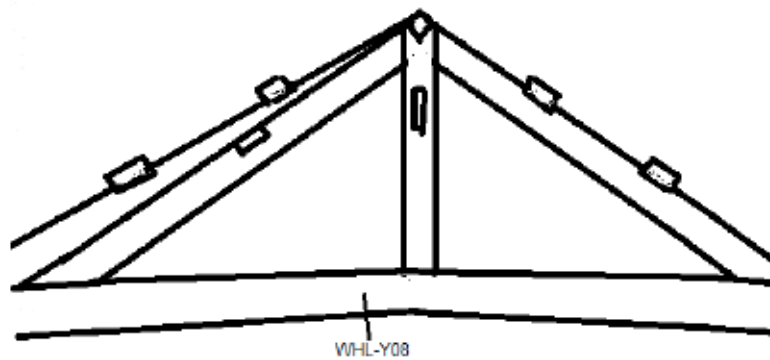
Sketch of truss 3, showing the location of sample WHL-Y08
